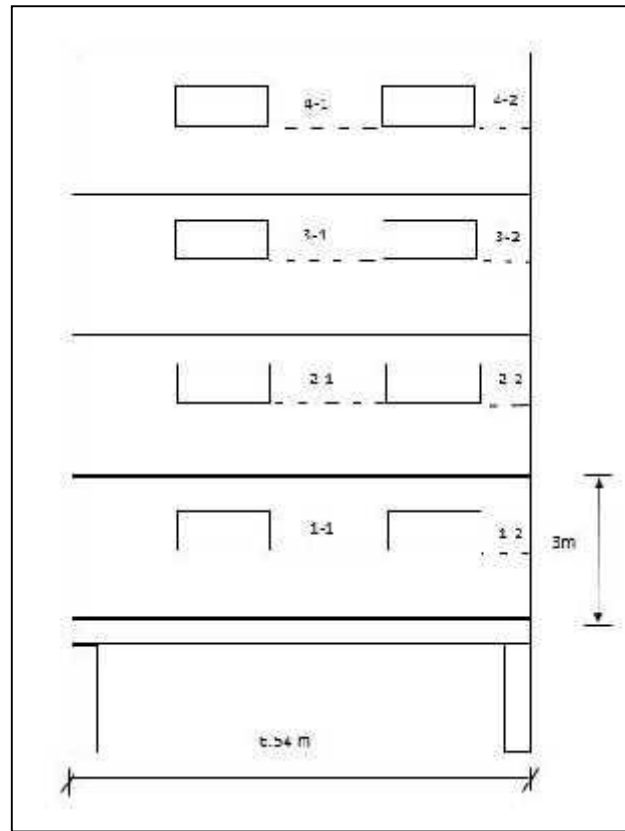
Schematic diagram showing the critical section cuts of wall C-C marked in the plan view of the building
